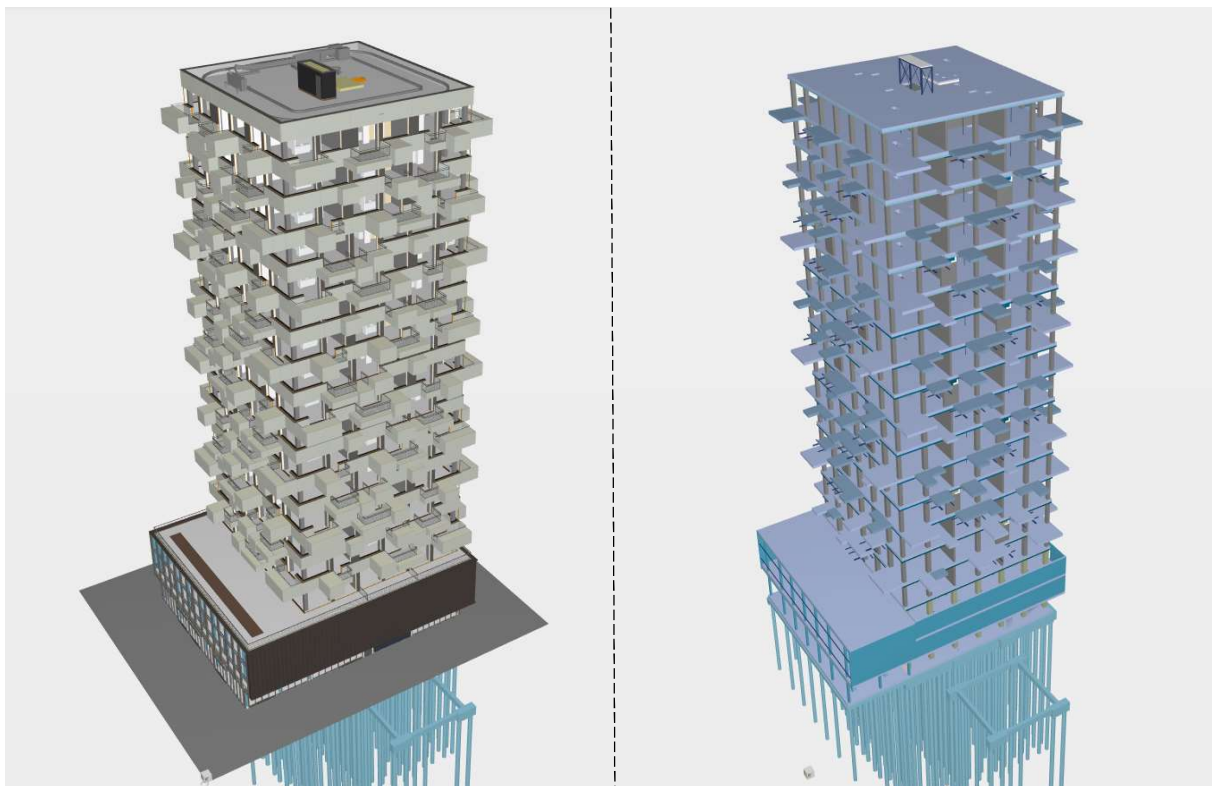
The Trudo Tower, where the architectural model (left) and the structural model (right) can be seen
